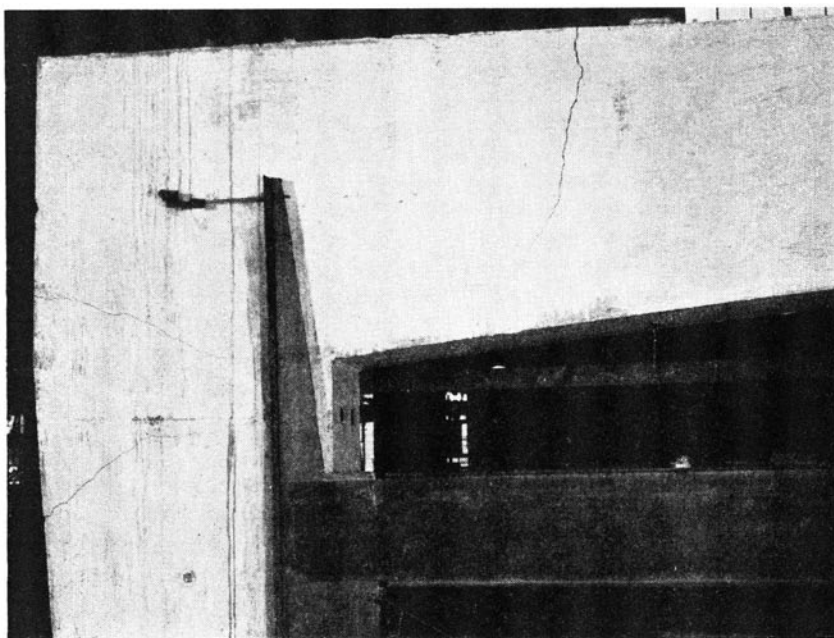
CRACKS AT WEST KNEE OF SPECIMEN 2 WITH BASES SPREAD 4 IN. AND CARRYING FIVE LIVE LOADS
